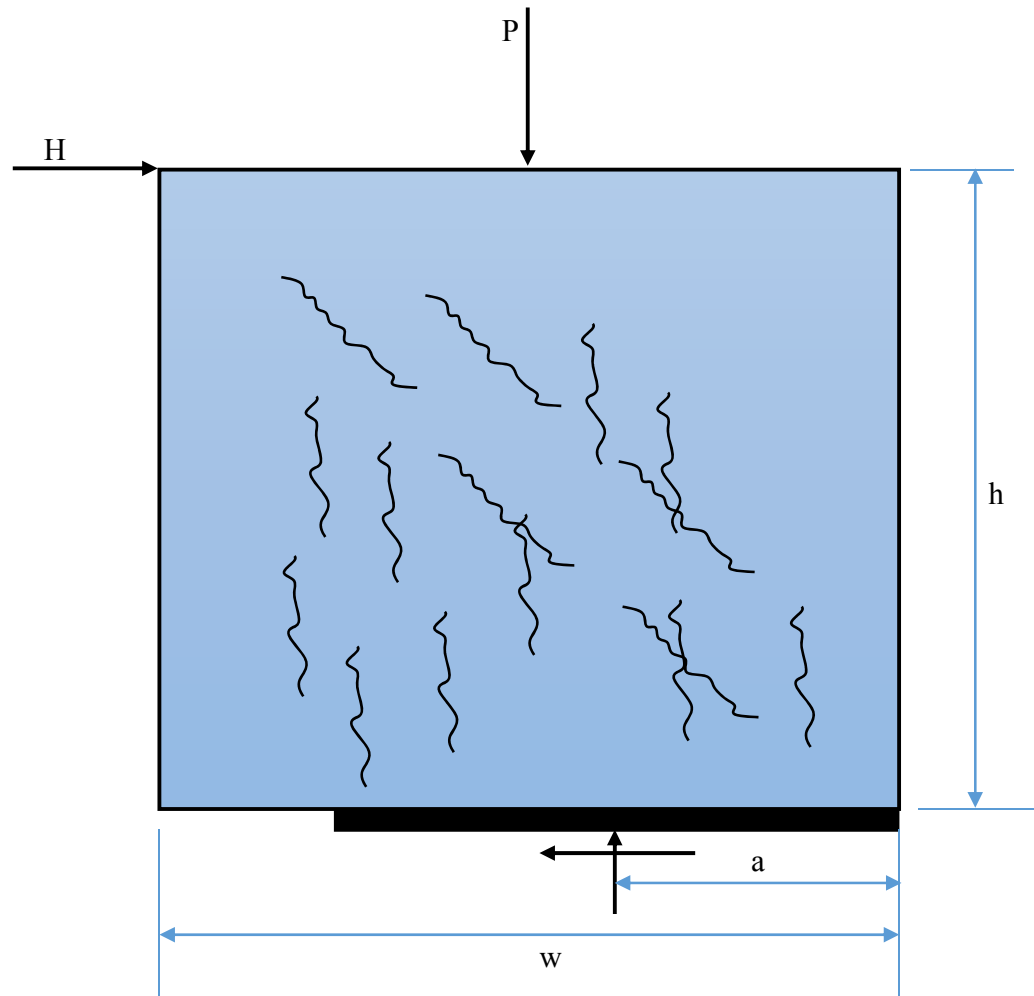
Simple Mechanistic model of wall behavior for damaged wall.
